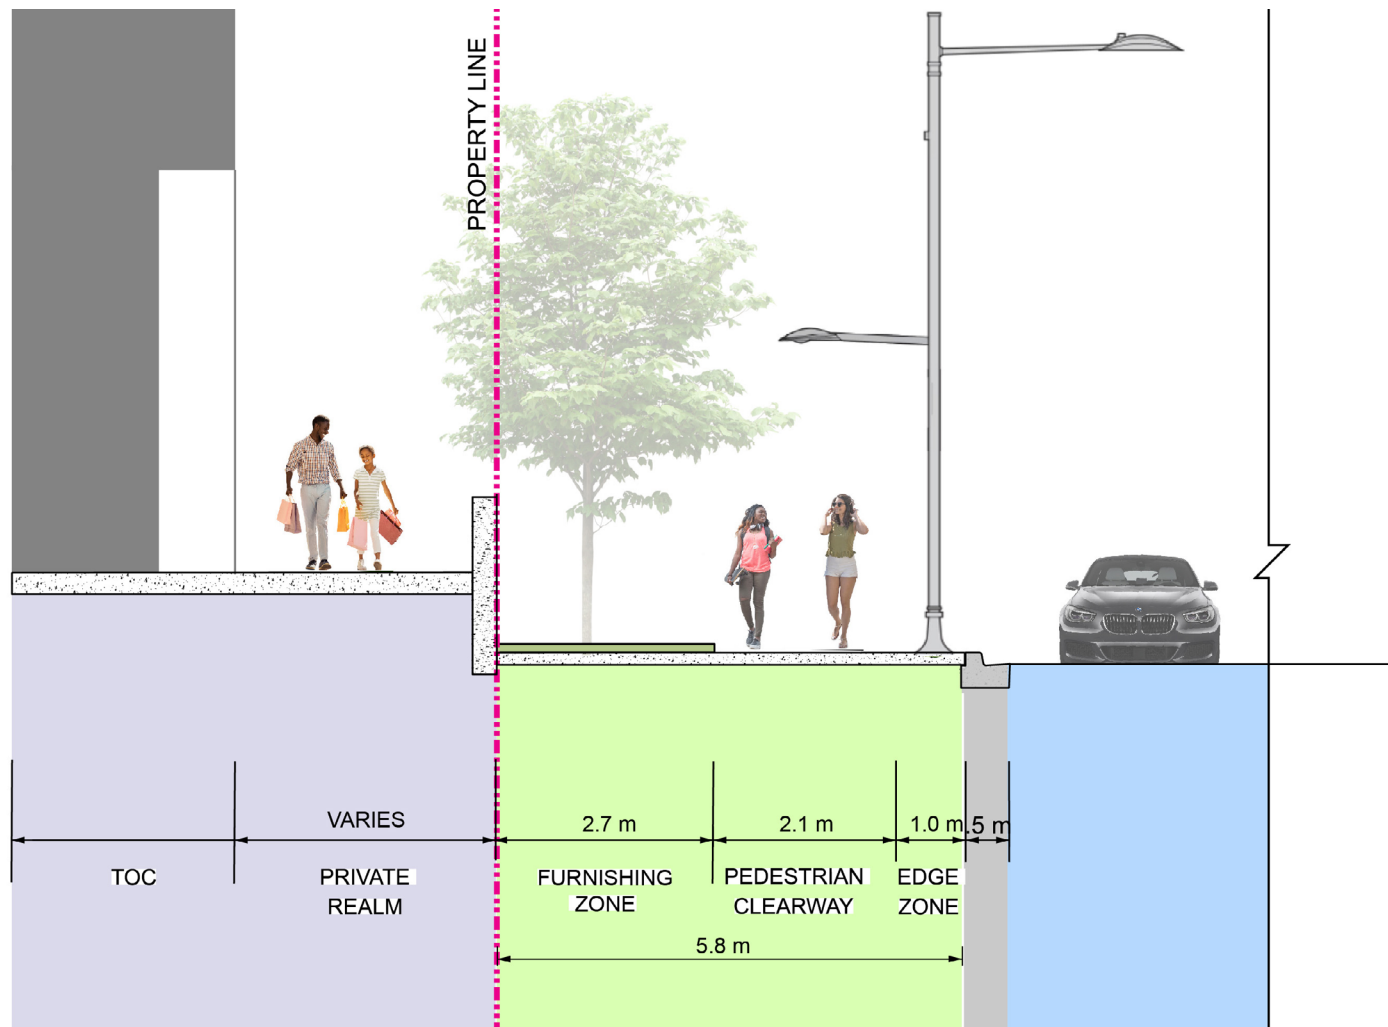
Lawrence Avenue East TOC Streetscape Section- Looking West
